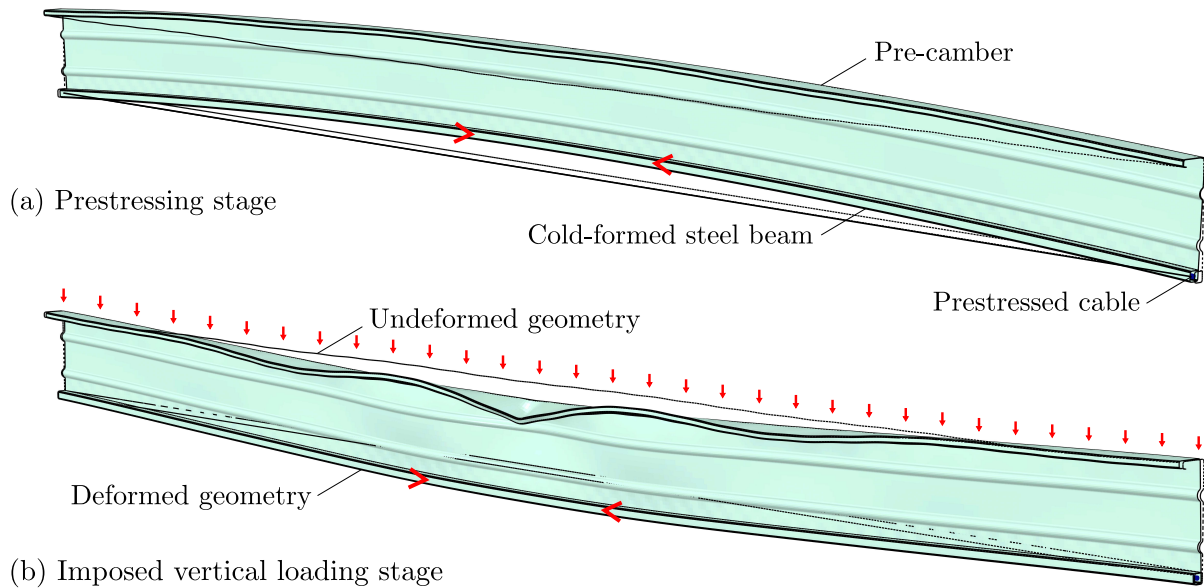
3-D representation of a prestressed cold-formed steel beam at the end of (a) the prestressing stage and (b) the imposed vertical loading stage.
